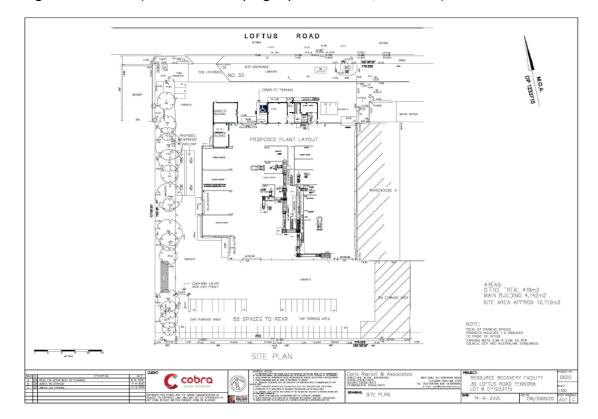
Site Plan (taken from Scoping report - DOC20/780213-1)
